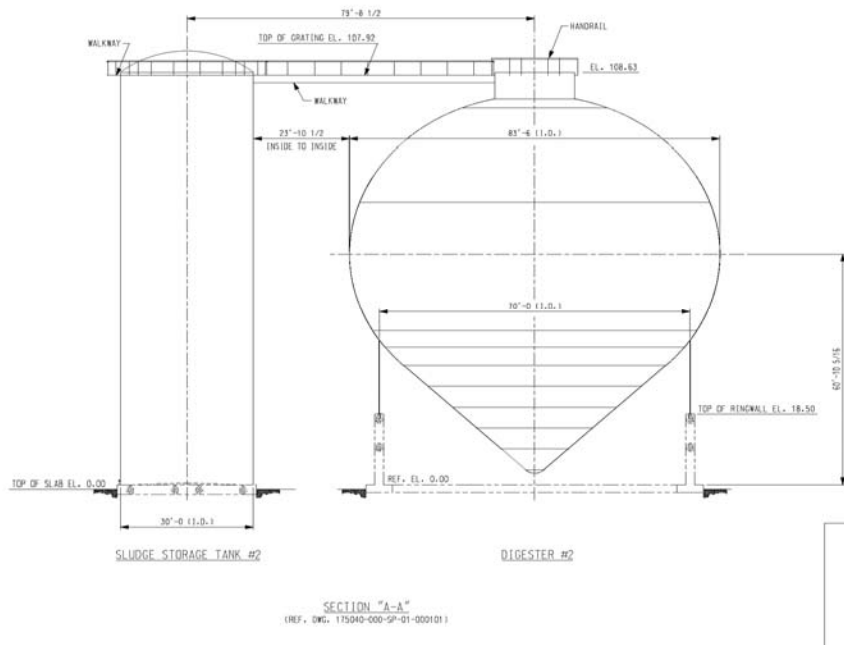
, Section A-A, View of Proposed Second ESD/SST.
